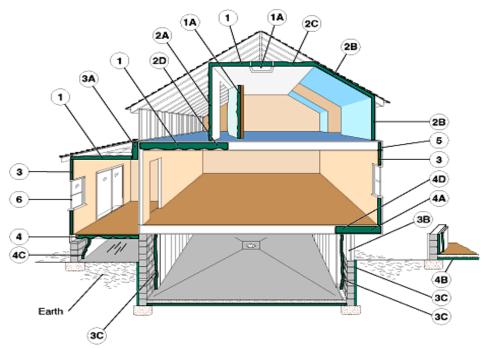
Places in a Typical House Where Insulation Should be Installed.
